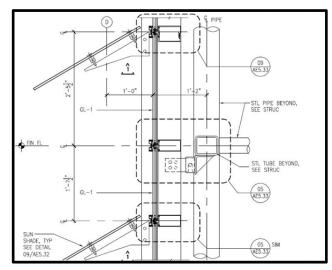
South Curtain Wall Partial Section - Courtesy of the Whiting-Turner/Walsh Joint
